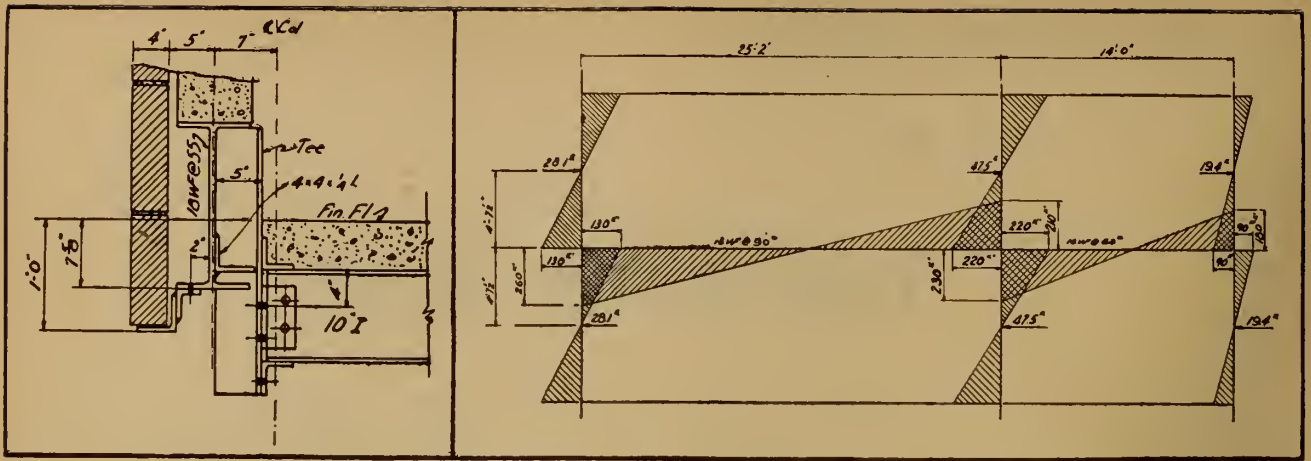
Typical wall cross section. Fig. 3—Wind moment diagram of a typical section through central portion of building.
